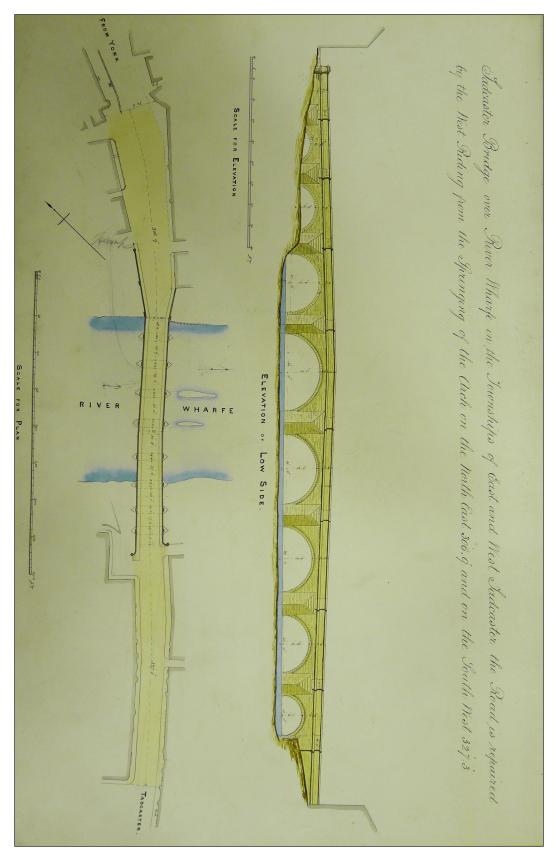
Plan and downstream elevation of Tadcaster Bridge as depicted in the undated but circa mid-19th century Bridges Book number 4. Arch 1 is to the right on the elevation and to the left on the plan. (WYAS QD3/23. Reproduced by permission of West Yorkshire Archive Service, Wakefield, copyright reserved).
